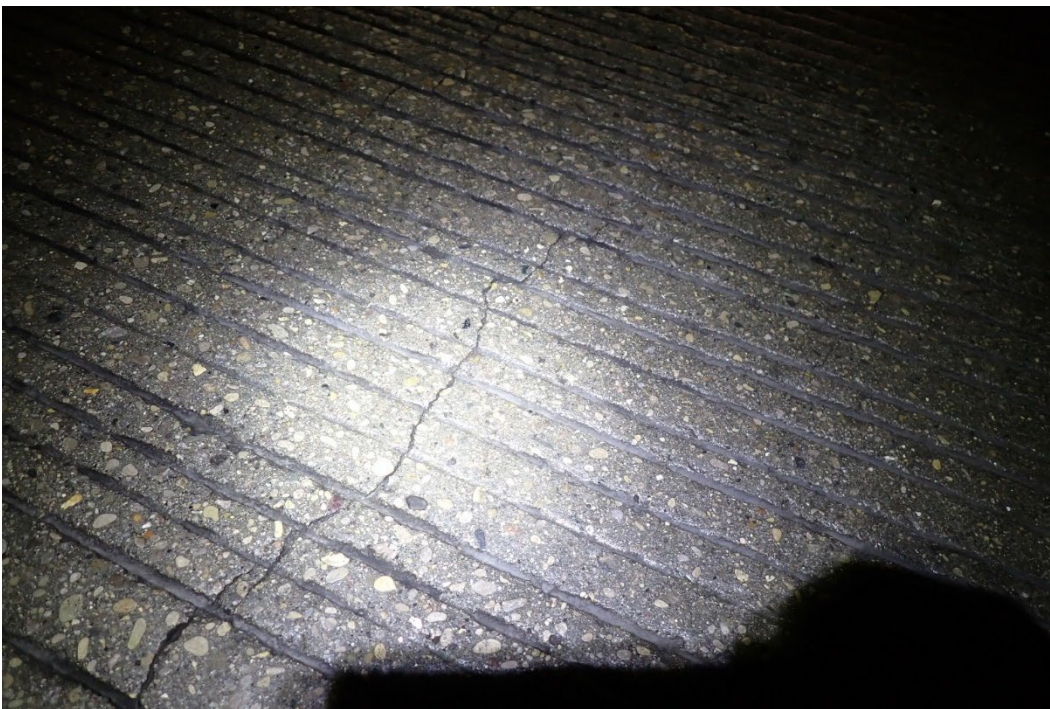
Typical 1' to 3' longitudinal cracking in wearing surface in Span 1A midspan, looking south.
